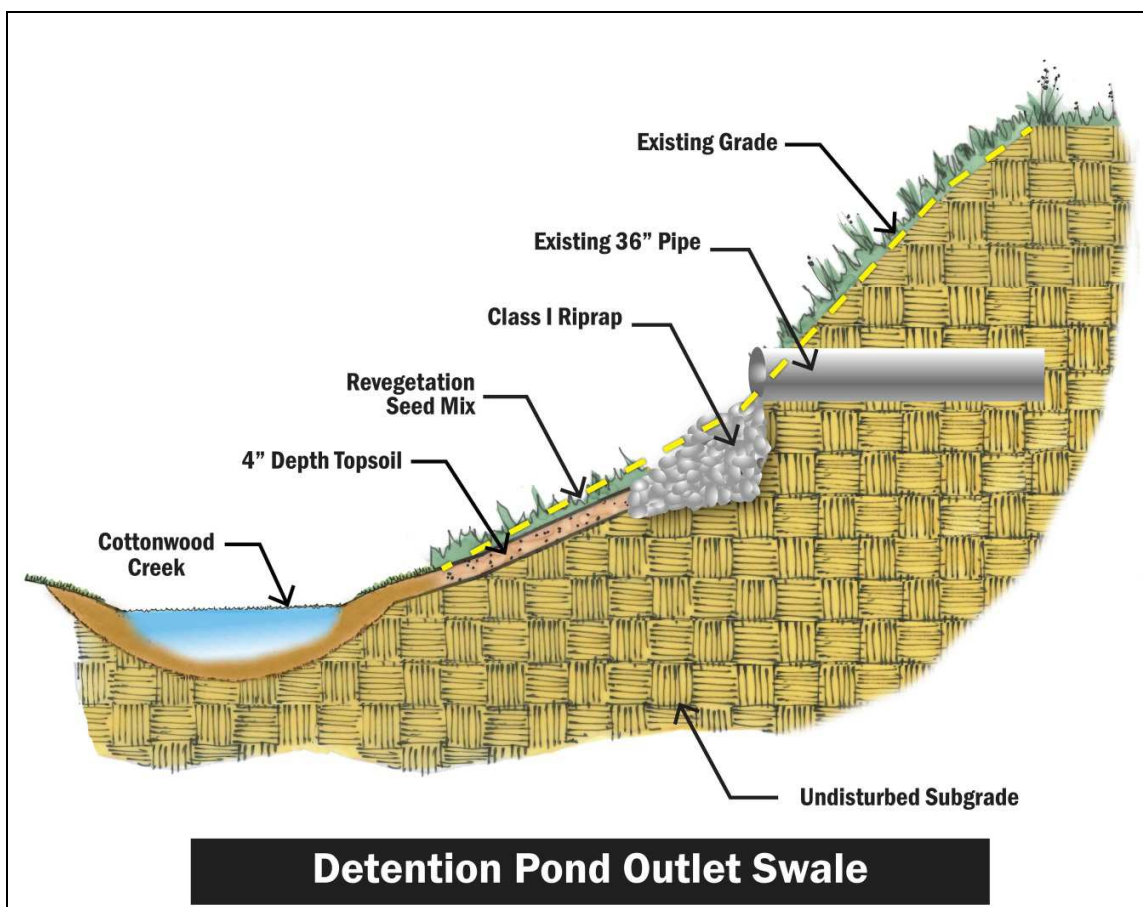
Detention Basin Discharge downstream of Railroad Trestle – Conceptual Section
